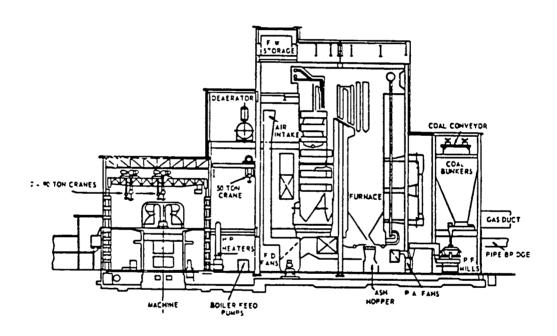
Typical cross section of power hall and boiler house (CEGB 1971, 68)
